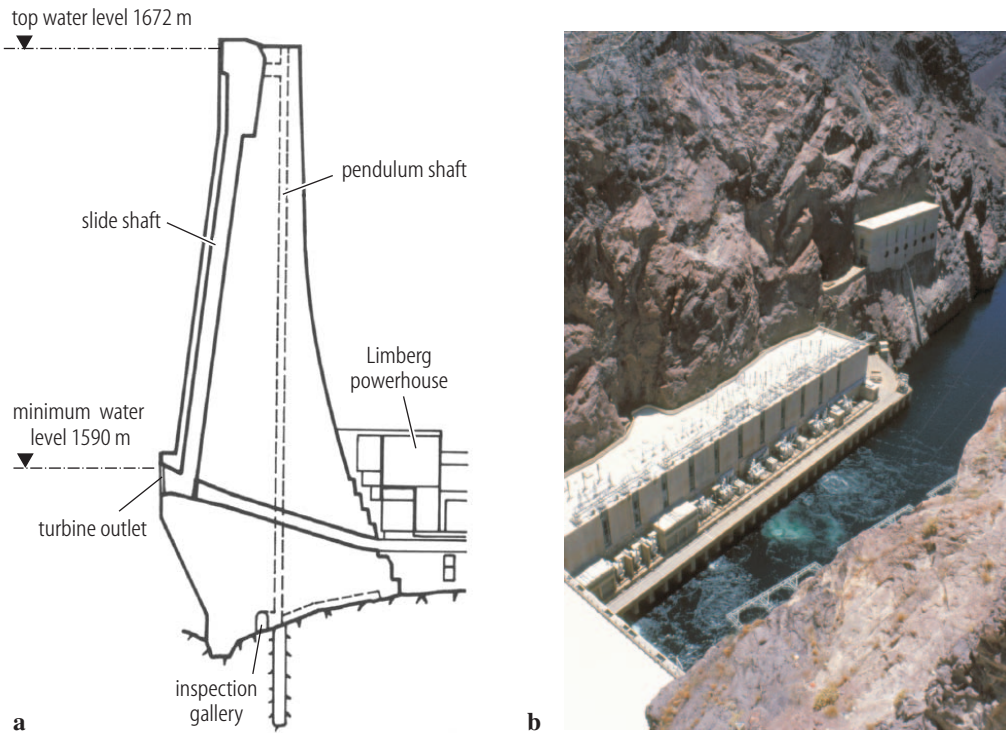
Powerhouse located at high dams. (a) Limberg arch dam, Austria. (b) Hoover dam, USA.
